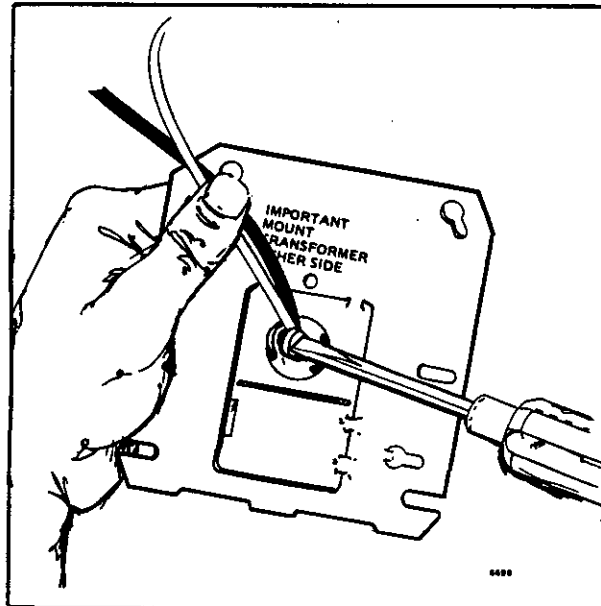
TIGHTEN CLAMP SECURELY AGAINST RIM OF ROUND HOLE.
